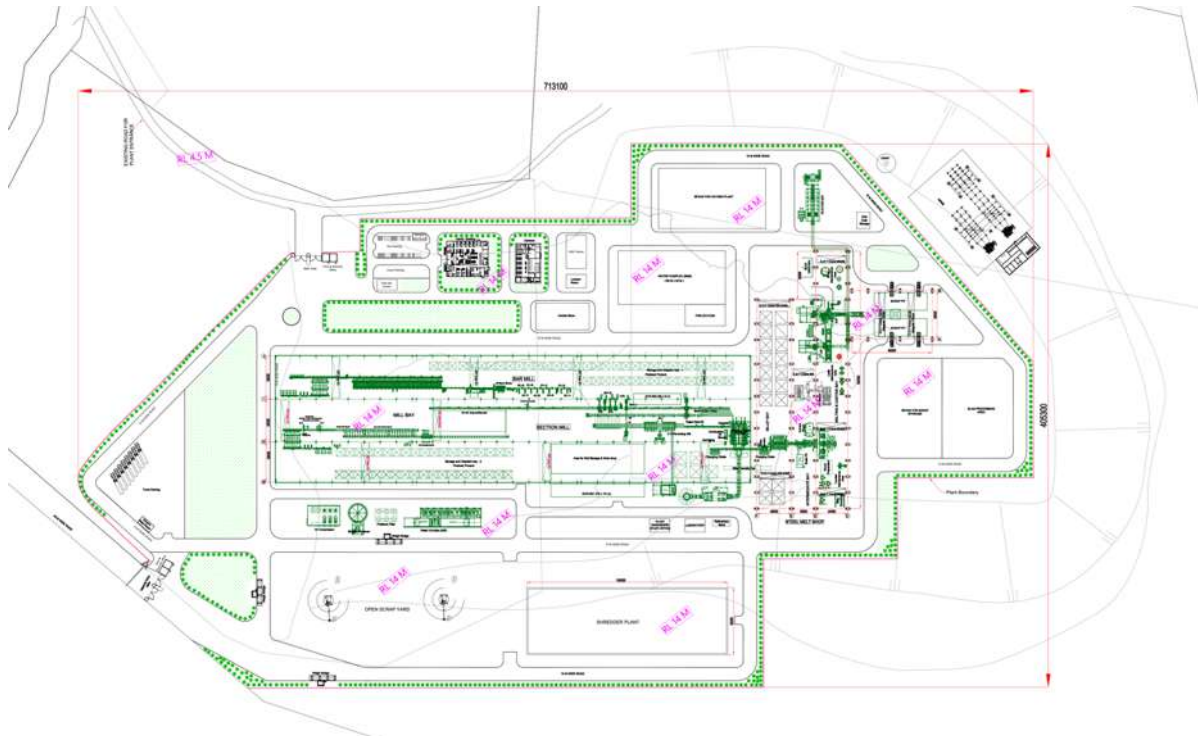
Proposed steel manufacturing plant in plan view ('within box') ¹⁰
